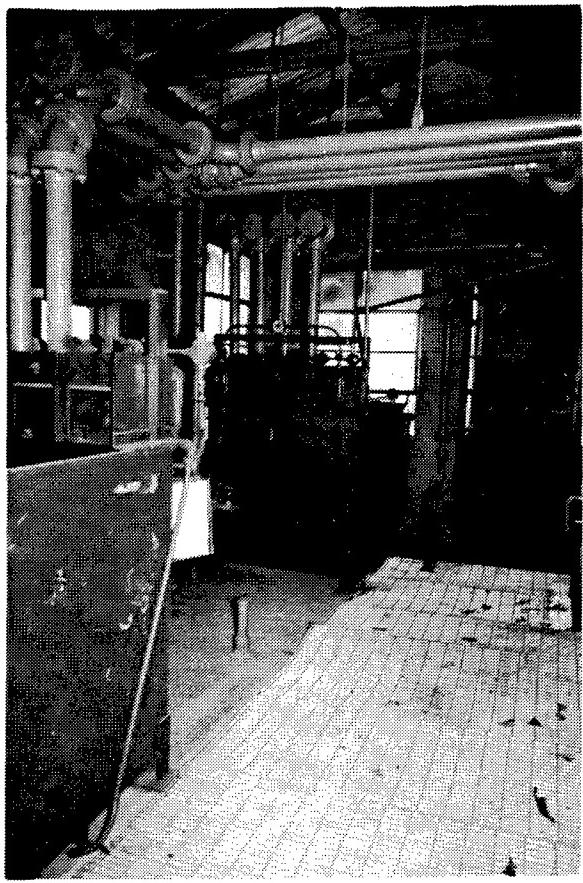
Building CB-4: Circulation pump in this Melt Loading Building.
